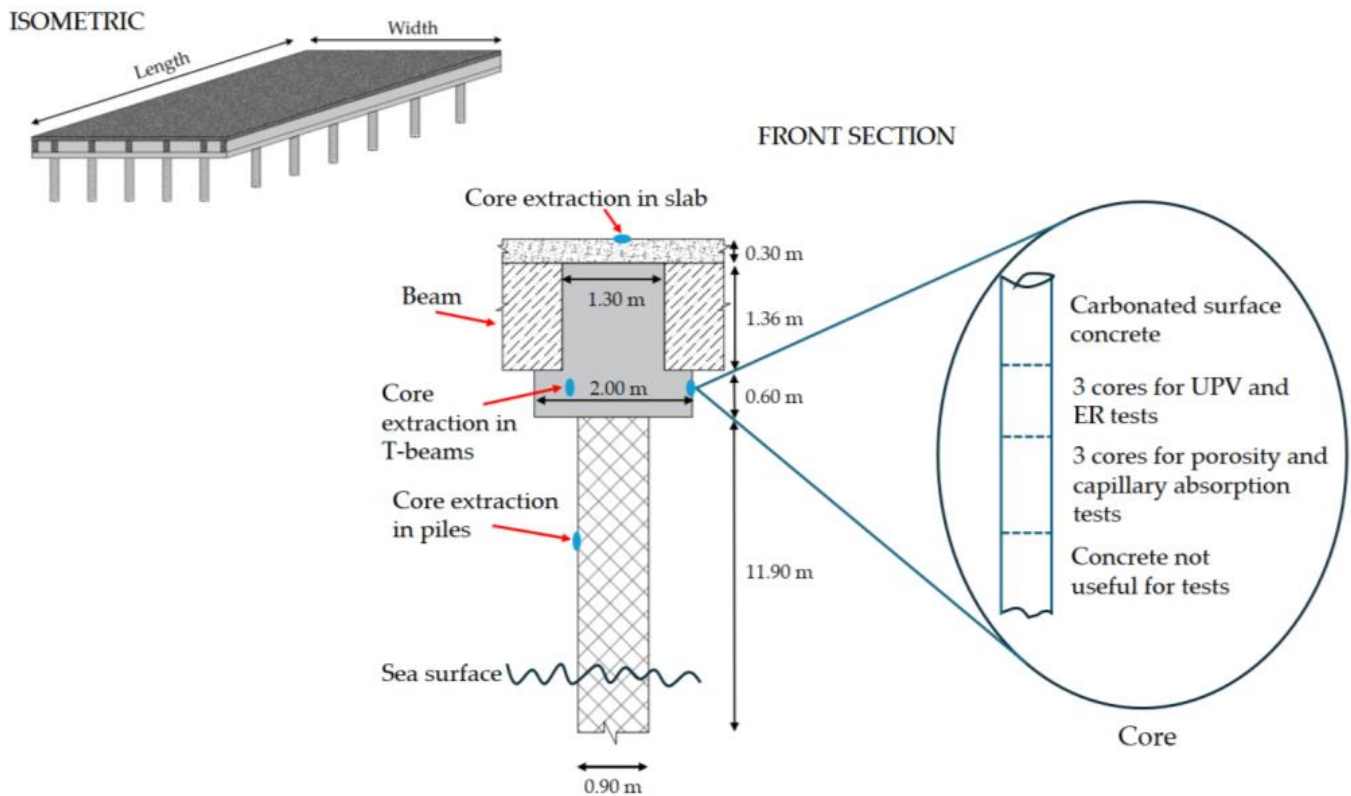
Schematic layout showing elements, general dimensions, and sampling locations for the piers.
